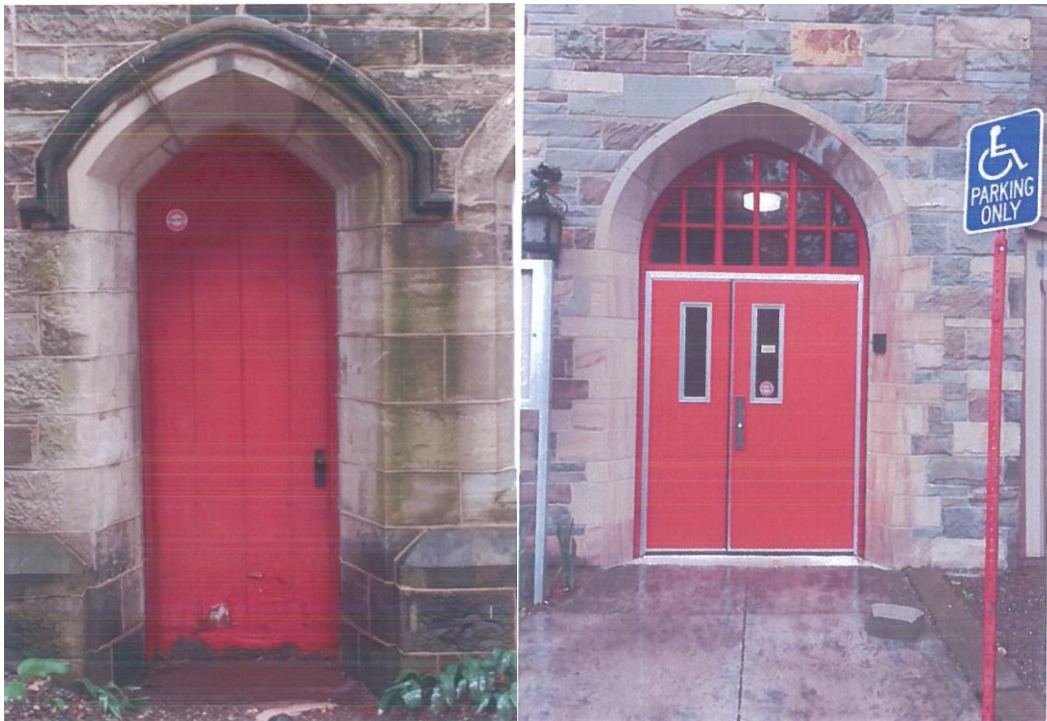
Left, current wood door. Right, replacement door on south elevation of the building. The proposed door will be made of FRP material like the example to the right. (2015)
